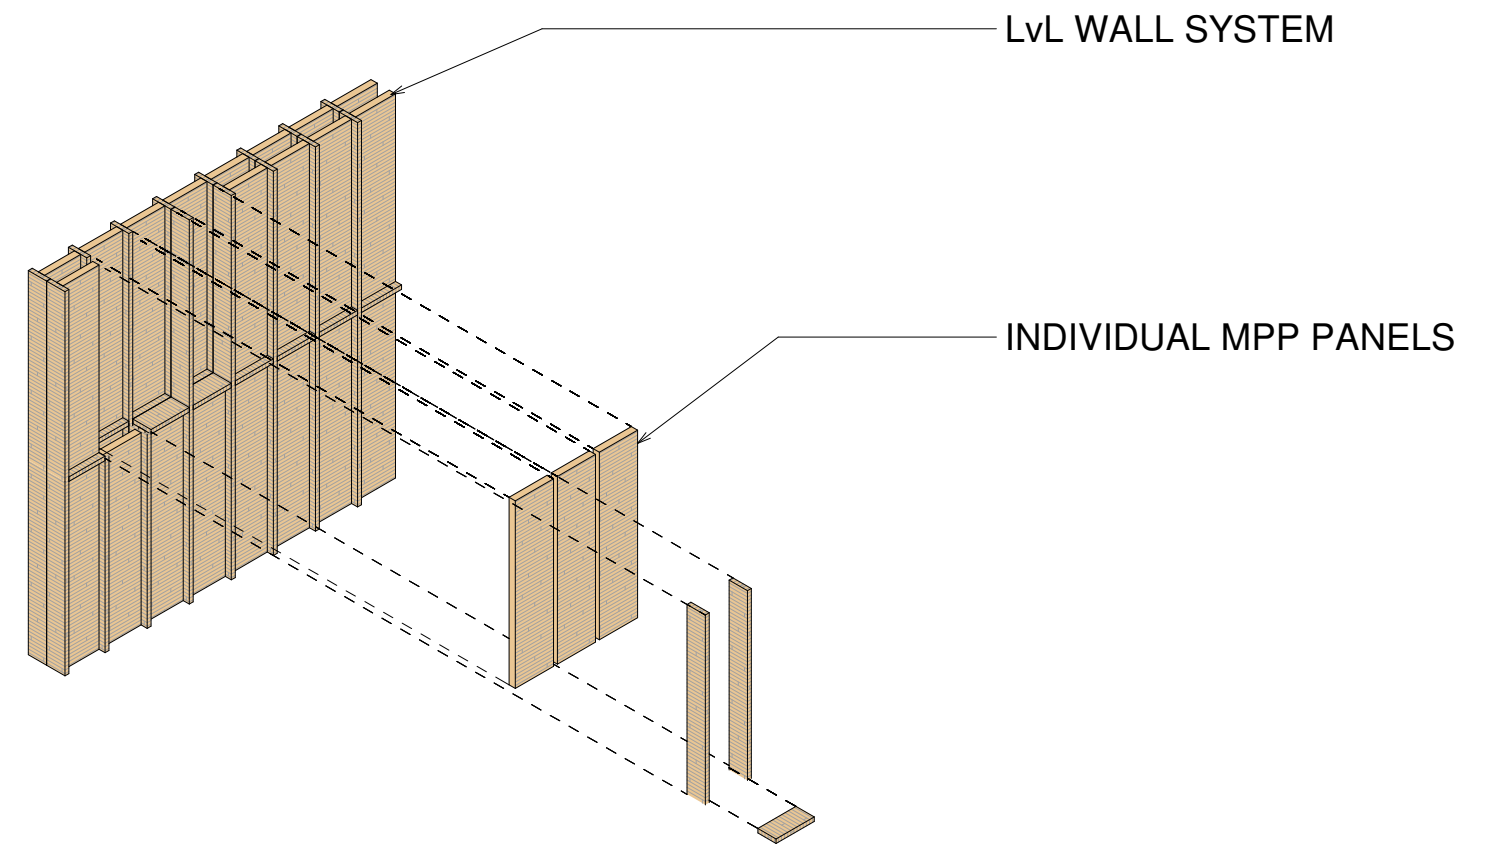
Wall Assembly of an interlocking LVL Mullion system with MPP panels installed between each void; Exploded Axon
